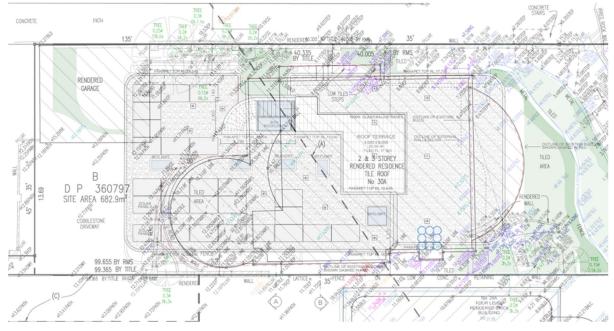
Overlay of the Detail & Boundary Survey atop of the Roof Plan
